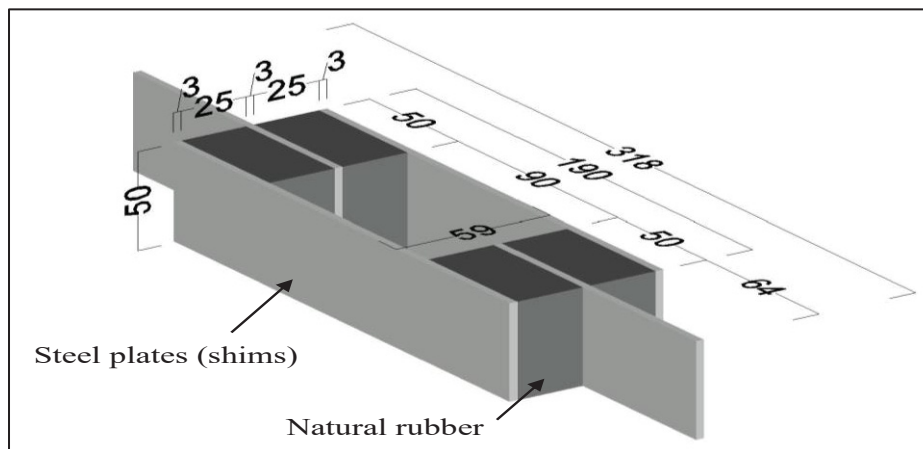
Nominal dimensions of specimens cut from the original Champlain Bridge bearing
